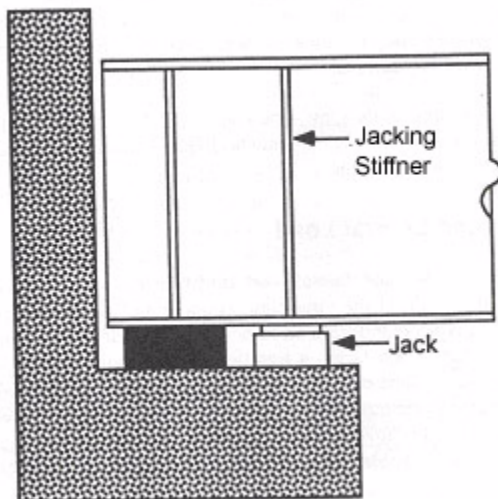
Jacking the Beams or Girders requires pre-approved procedures
